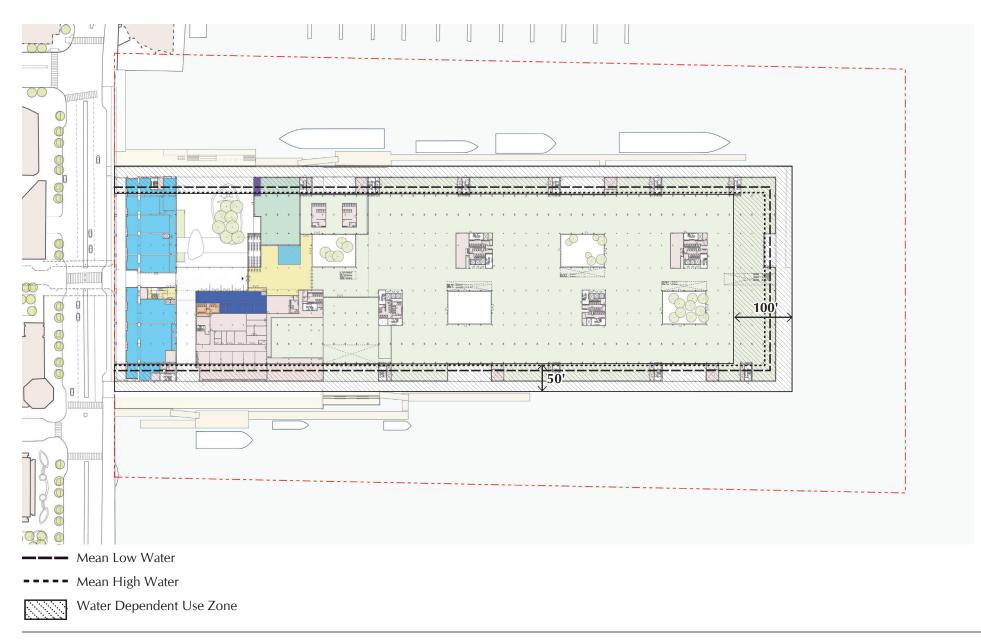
Proposed Conditions Plan Source: Sasaki, 2019
